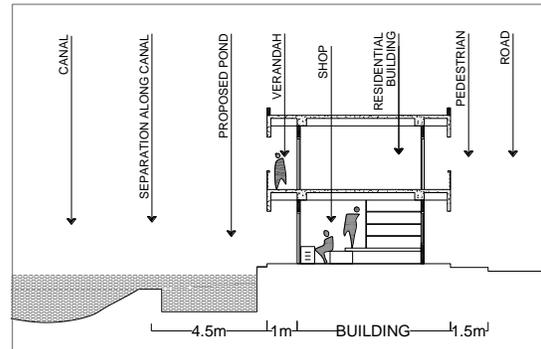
Typical mixed-used building (shop and residential use) section with landscape feature at existing 4.5m setback for waterfront accessibility both physically and visually
